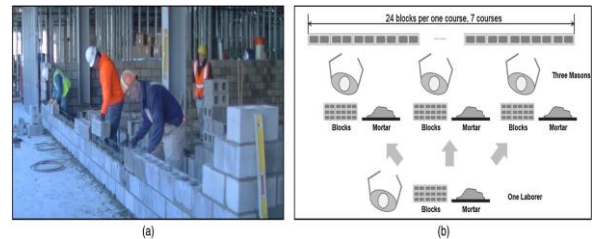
Site conditions (image by authors): (a) site photo; (b) site layout
